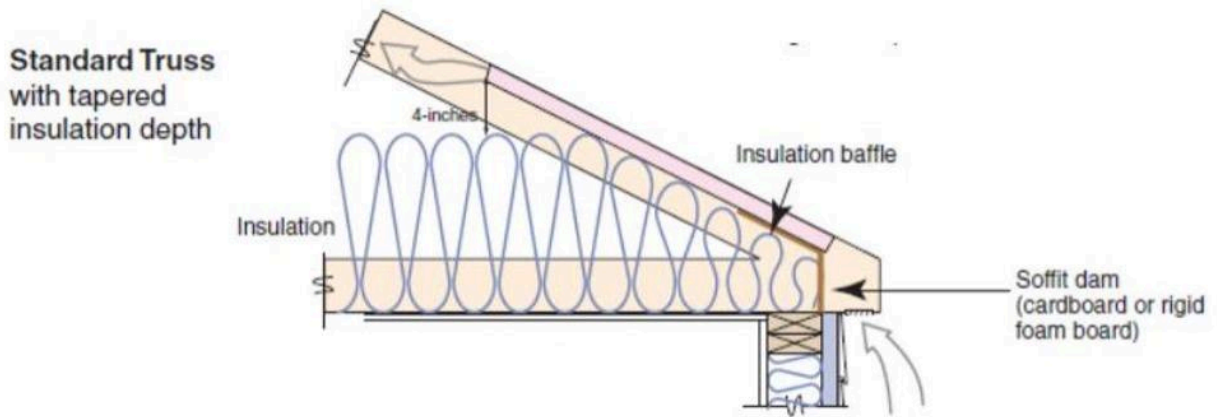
Standard roof trusses are narrow at the eaves, preventing full insulation thickness over the top plate of the exterior walls. Image source: Building America Solution Center [6]
